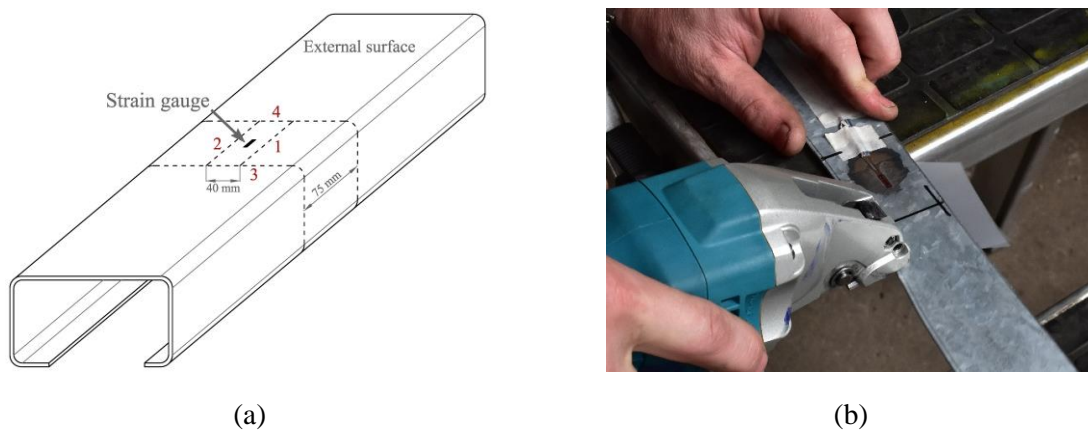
The sectioning technique: (a) cut lines location and sequence, (b) cutting tool
